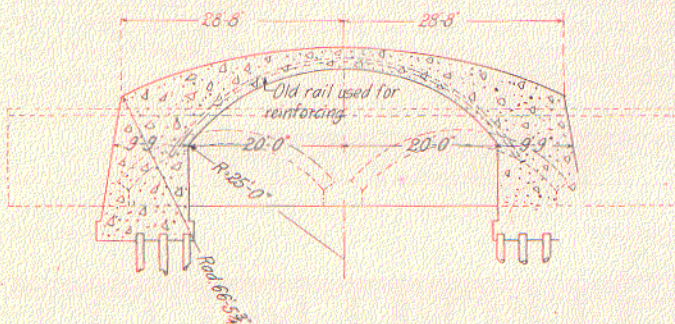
Forty-foot Arch Over Beaver Brook, Bridgeville
